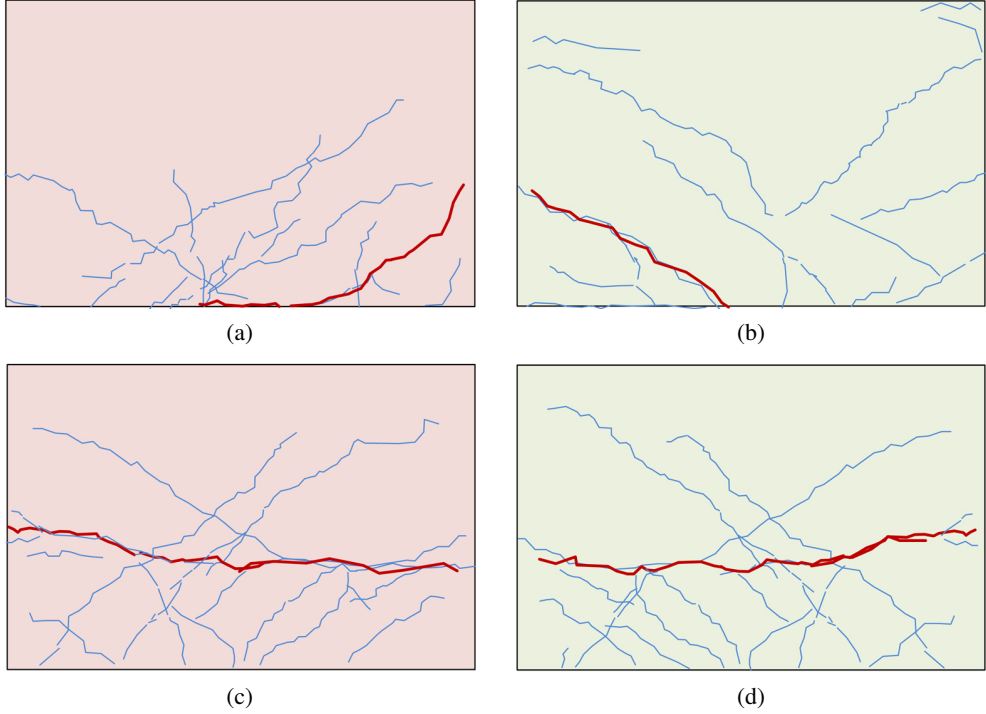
Crack Distribution of PS-1 and PS-2 Specimens; (a) Distribution map of wall frontage cracks of PS-1, (b) Distribution map of wall reverse cracks of PS-1, (c) Distribution map of wall frontage cracks of PS-2, (d) Distribution map of wall reverse cracks of PS-2
